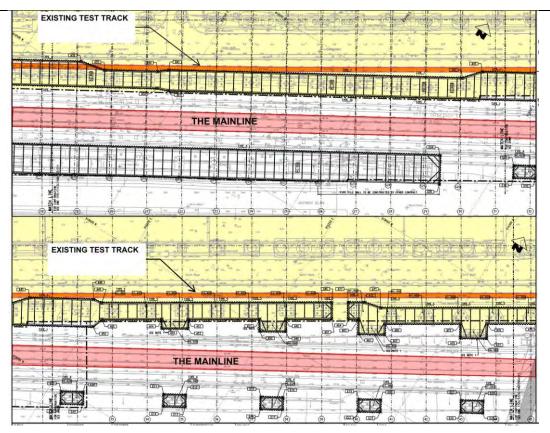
Sheet Pile Layout Plan - G.L. 18-32/P-Q (Top) and G.L. 31-45/P-Q (Bottom)
